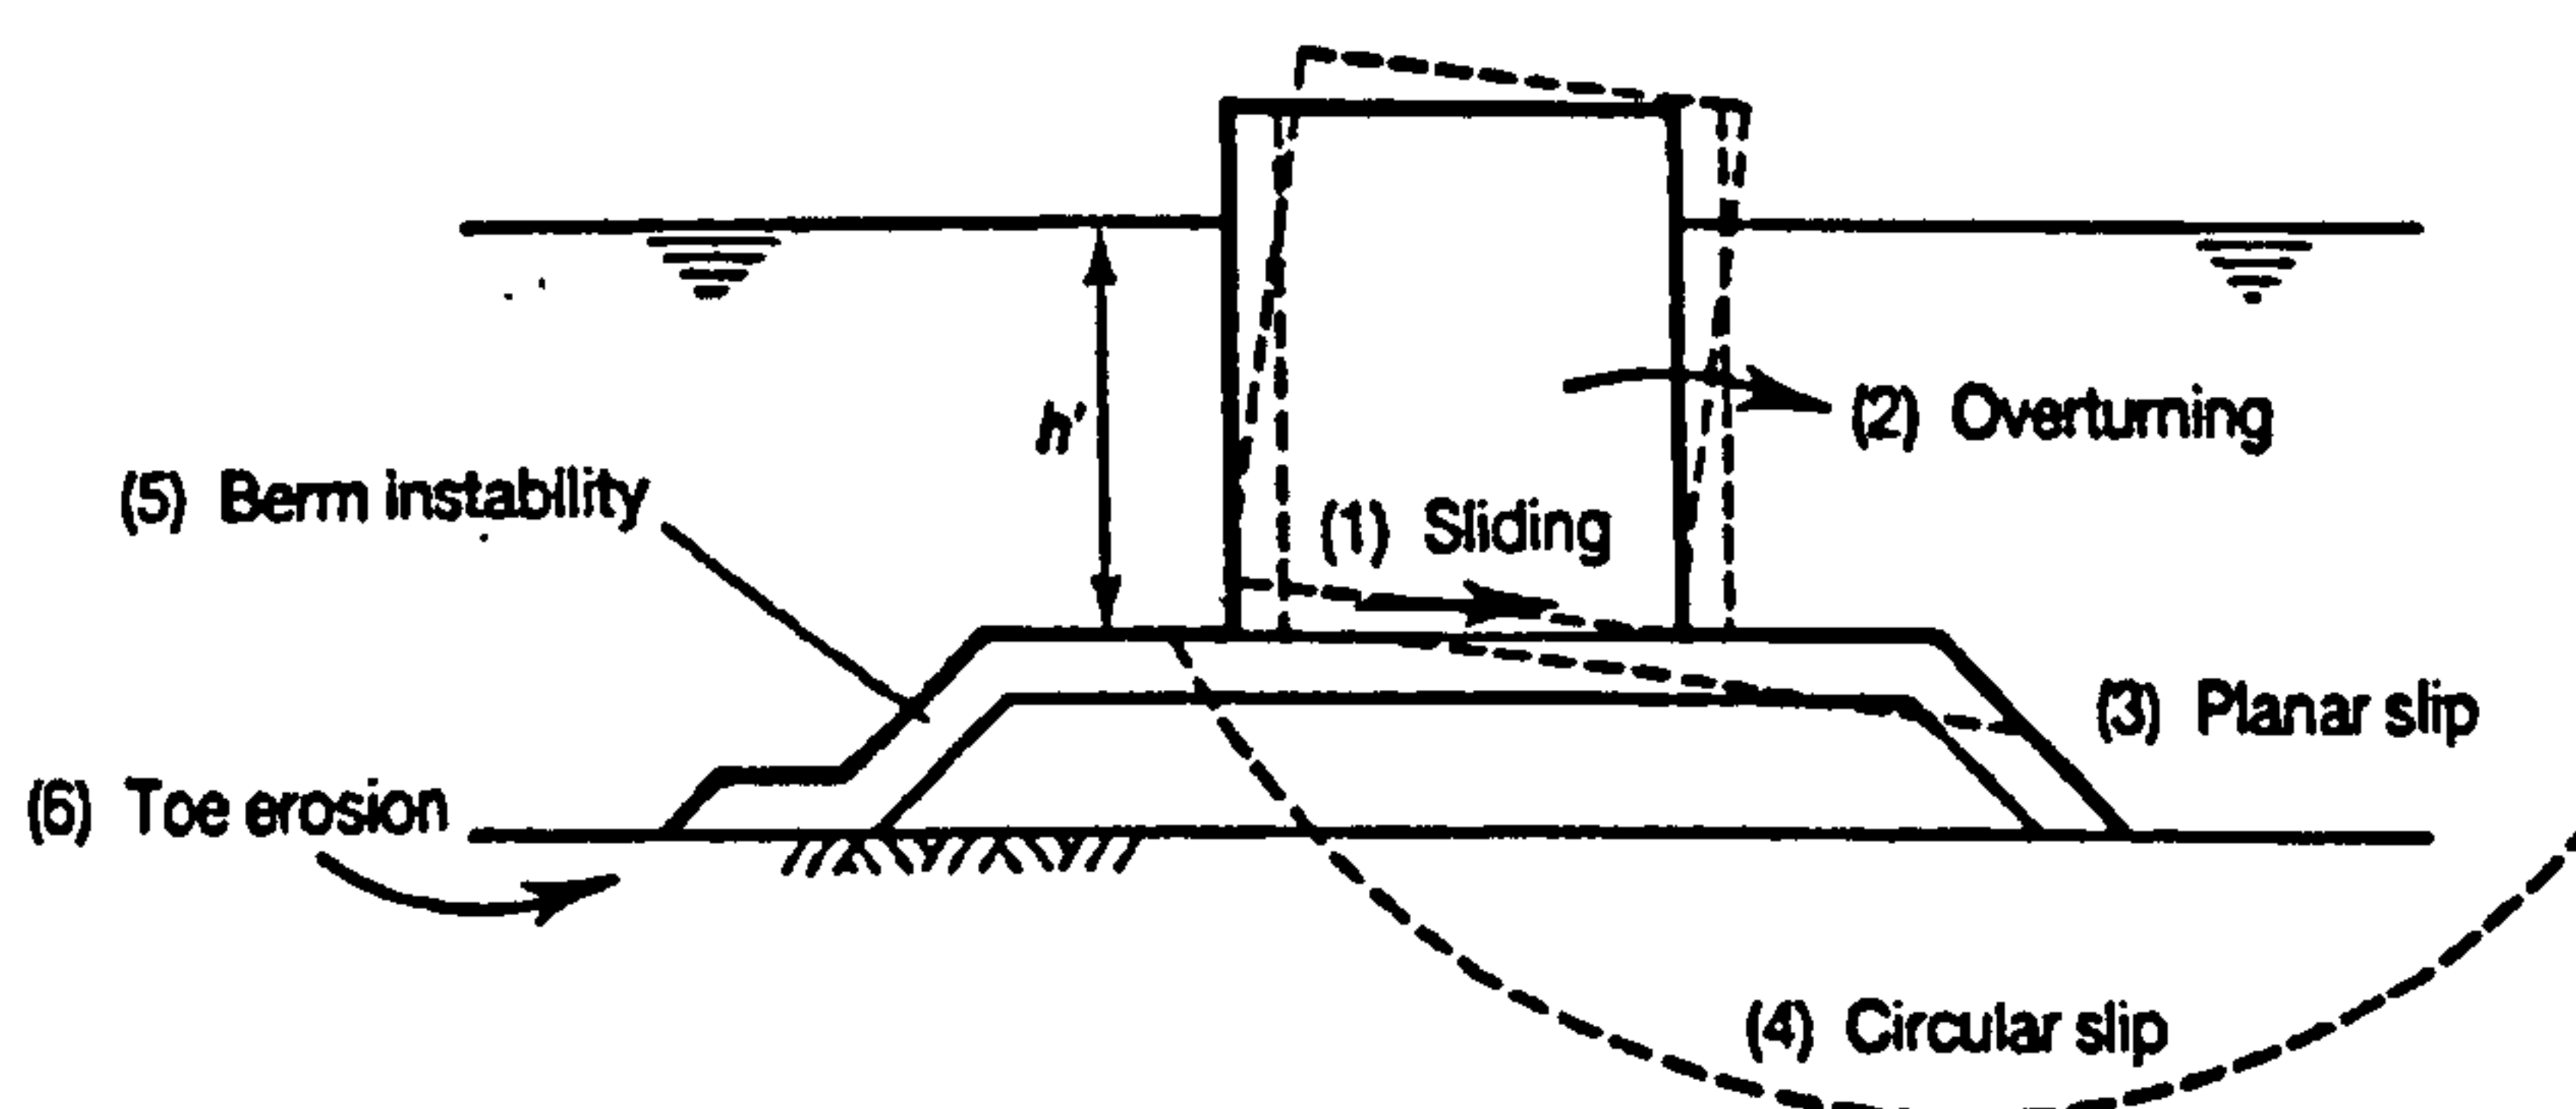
Failure modes of a vertical breakwater on top of a rock foundation (CIRIA and CUR, 1991)
